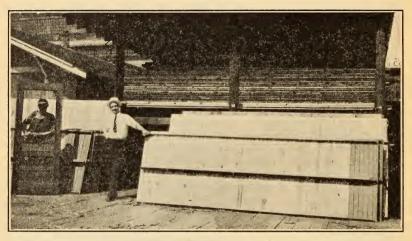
Finished 4-foot roof sections. Sectional and ready-cut buildings require about 250,000,000 feet yearly, of which slightly more than half is used in short lengths and only about one-sixth is bought in that form
